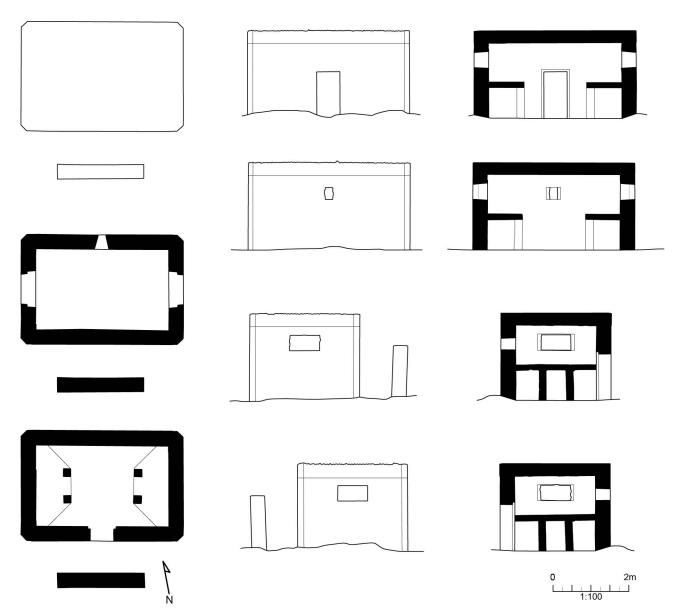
(In columns from left to right): Plans and elevations of the pillbox. Roof plan; Plan at window height; Ground plan; External S elev (minus the anti-blast wall); External N elev; External W elev; External E elev; Internal S elev; Internal N elev; Internal E elev; Internal W elev. NB all internal elevations showing sections through the centre line of the walls
